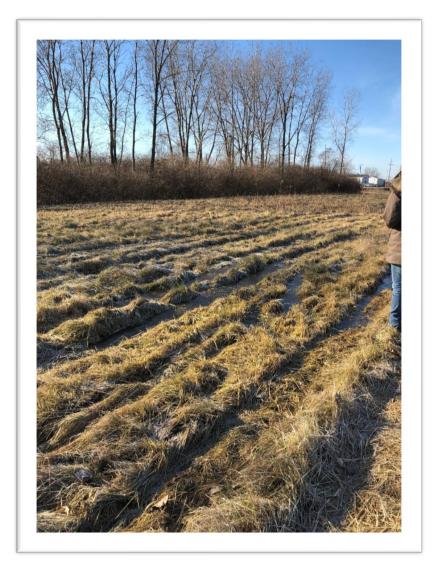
Ponding observed along southern edge of the site, looking southwest.
